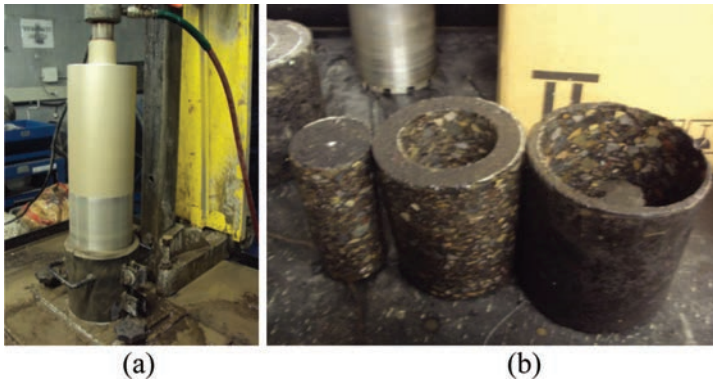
(a) coring process, and (b) specimen geometry (centre).
